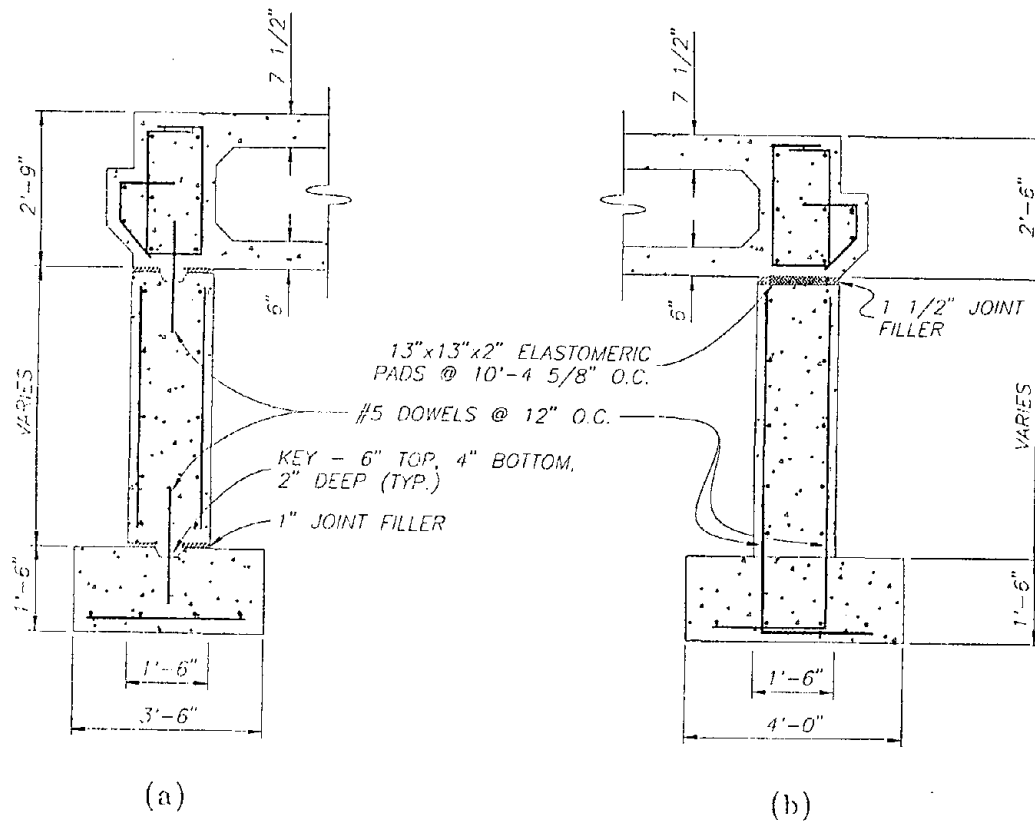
Abutment Sections: (a) I-1000 and I-1086N; (b) I-1171
